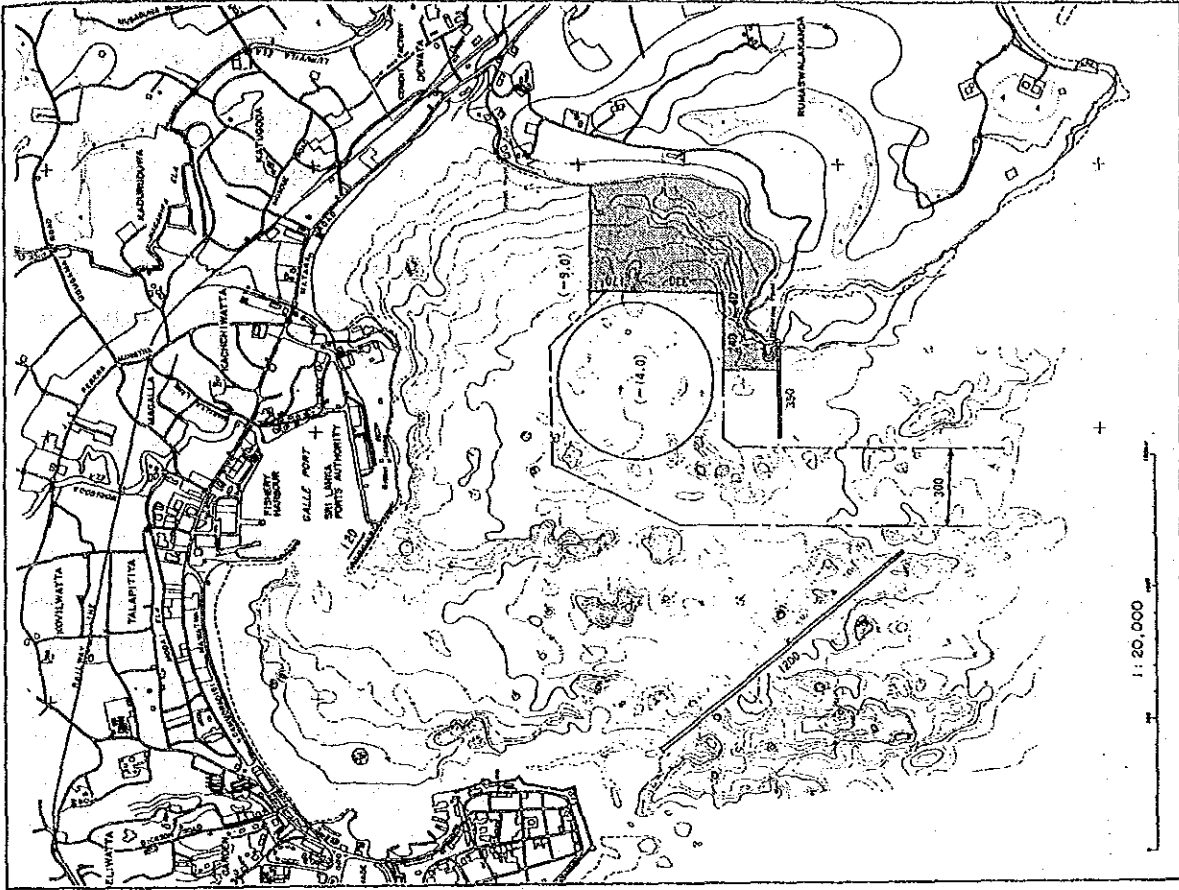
Short Term Development Plan (Alternative 2)
